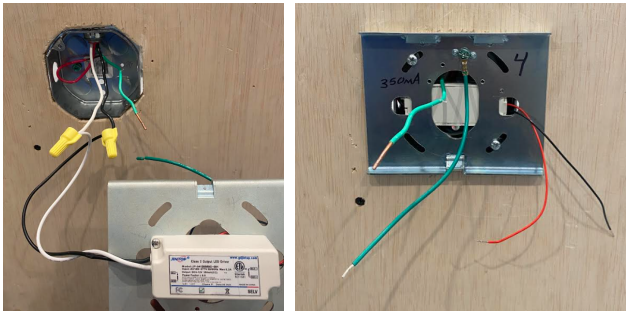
Wiring for junction box & driver. Secured mounting bracket.
